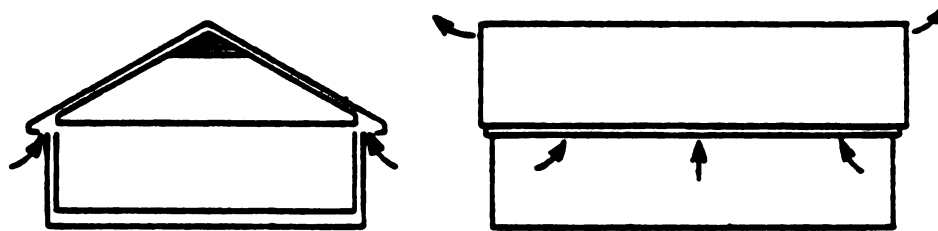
Inlets at eave, outlets at ridge for good ventilation.
